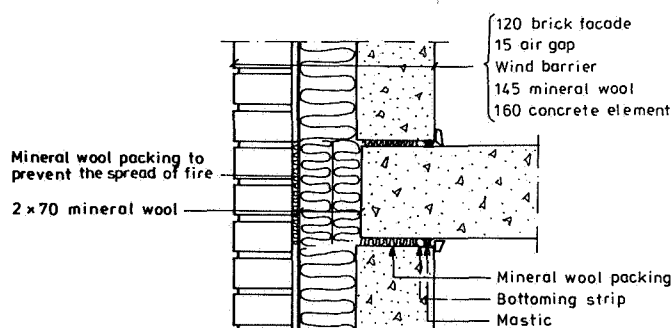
Joint between gable external wall of concrete elements and intermediate joist structure.
